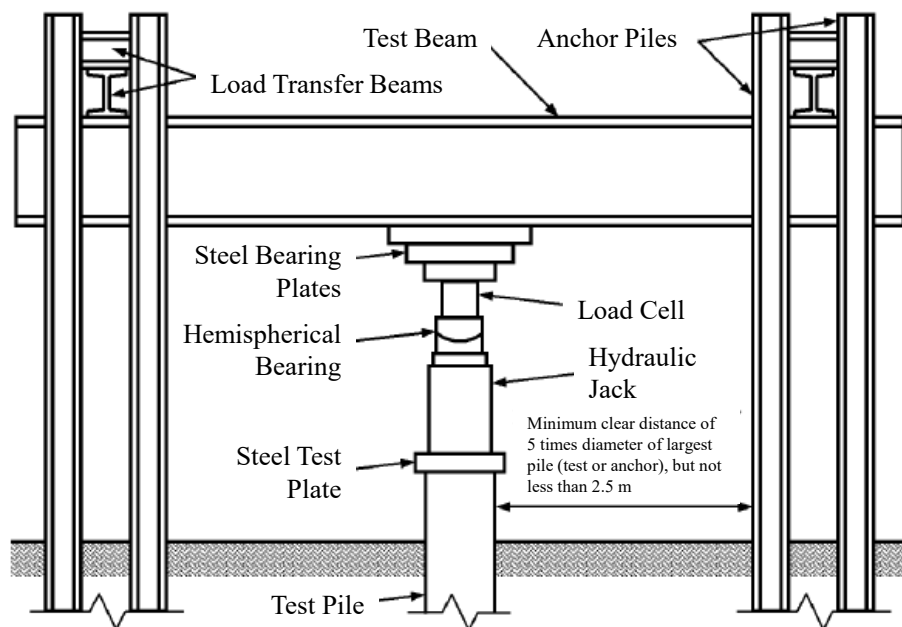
Schematic of hydraulic jack acting against anchored reaction frame (after ASTM International 2013)
